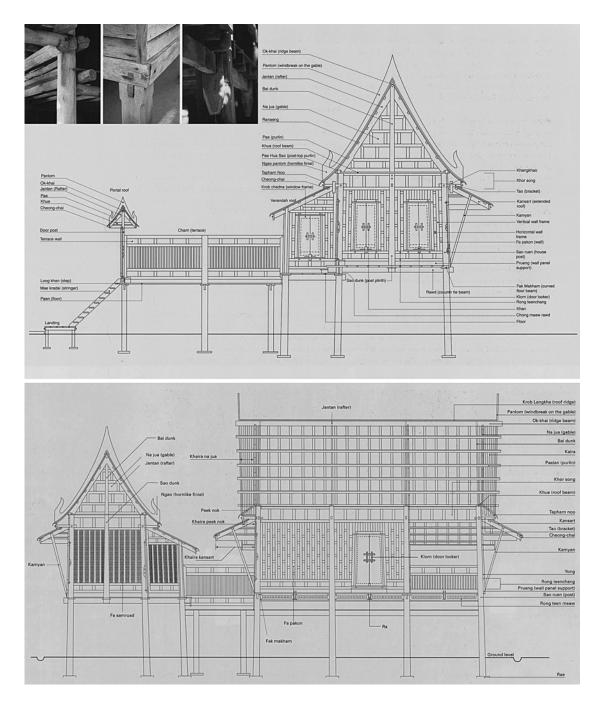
From top to bottom; the details of joinery and the two end elevations of wooden Thai houses called 'Ruen Krueng Sab' (Chaichongrak 2002, p.61 & 81) and (Sthapitanonda 2006, p.71)
